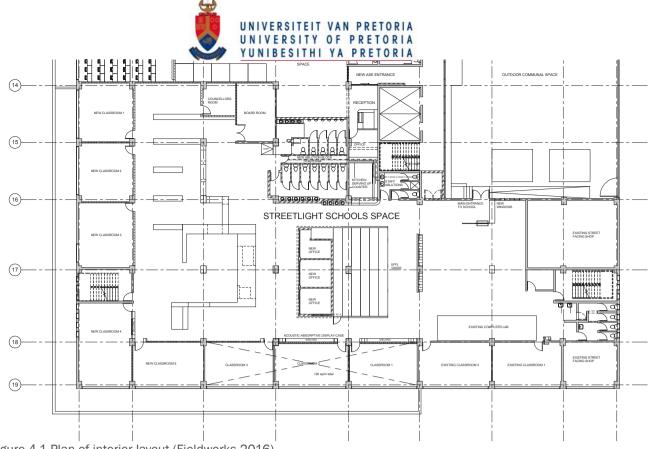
Plan of interior layout (Fieldworks, 2016)
